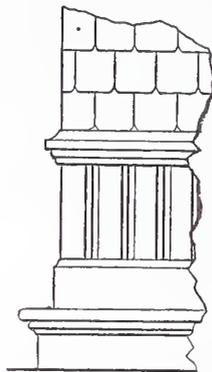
Detail of Base and Siding.—Scale, 1/2 Inch to the Foot.
